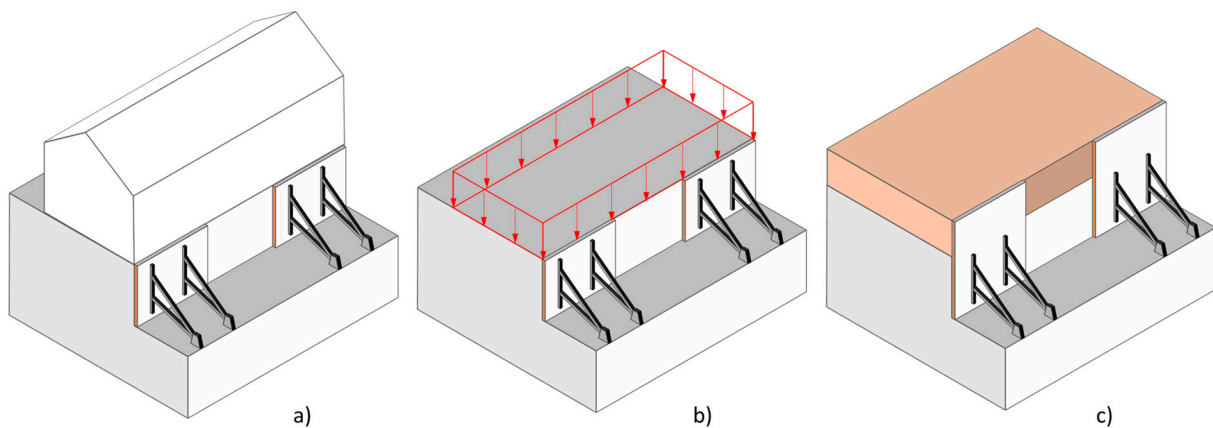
Simplified procedure to consider a load over the top of the slope. (a) Actual excavation near a building (b) Load equivalent to the building (c) Soil stratum added to the initial excavation to study slope stability.
